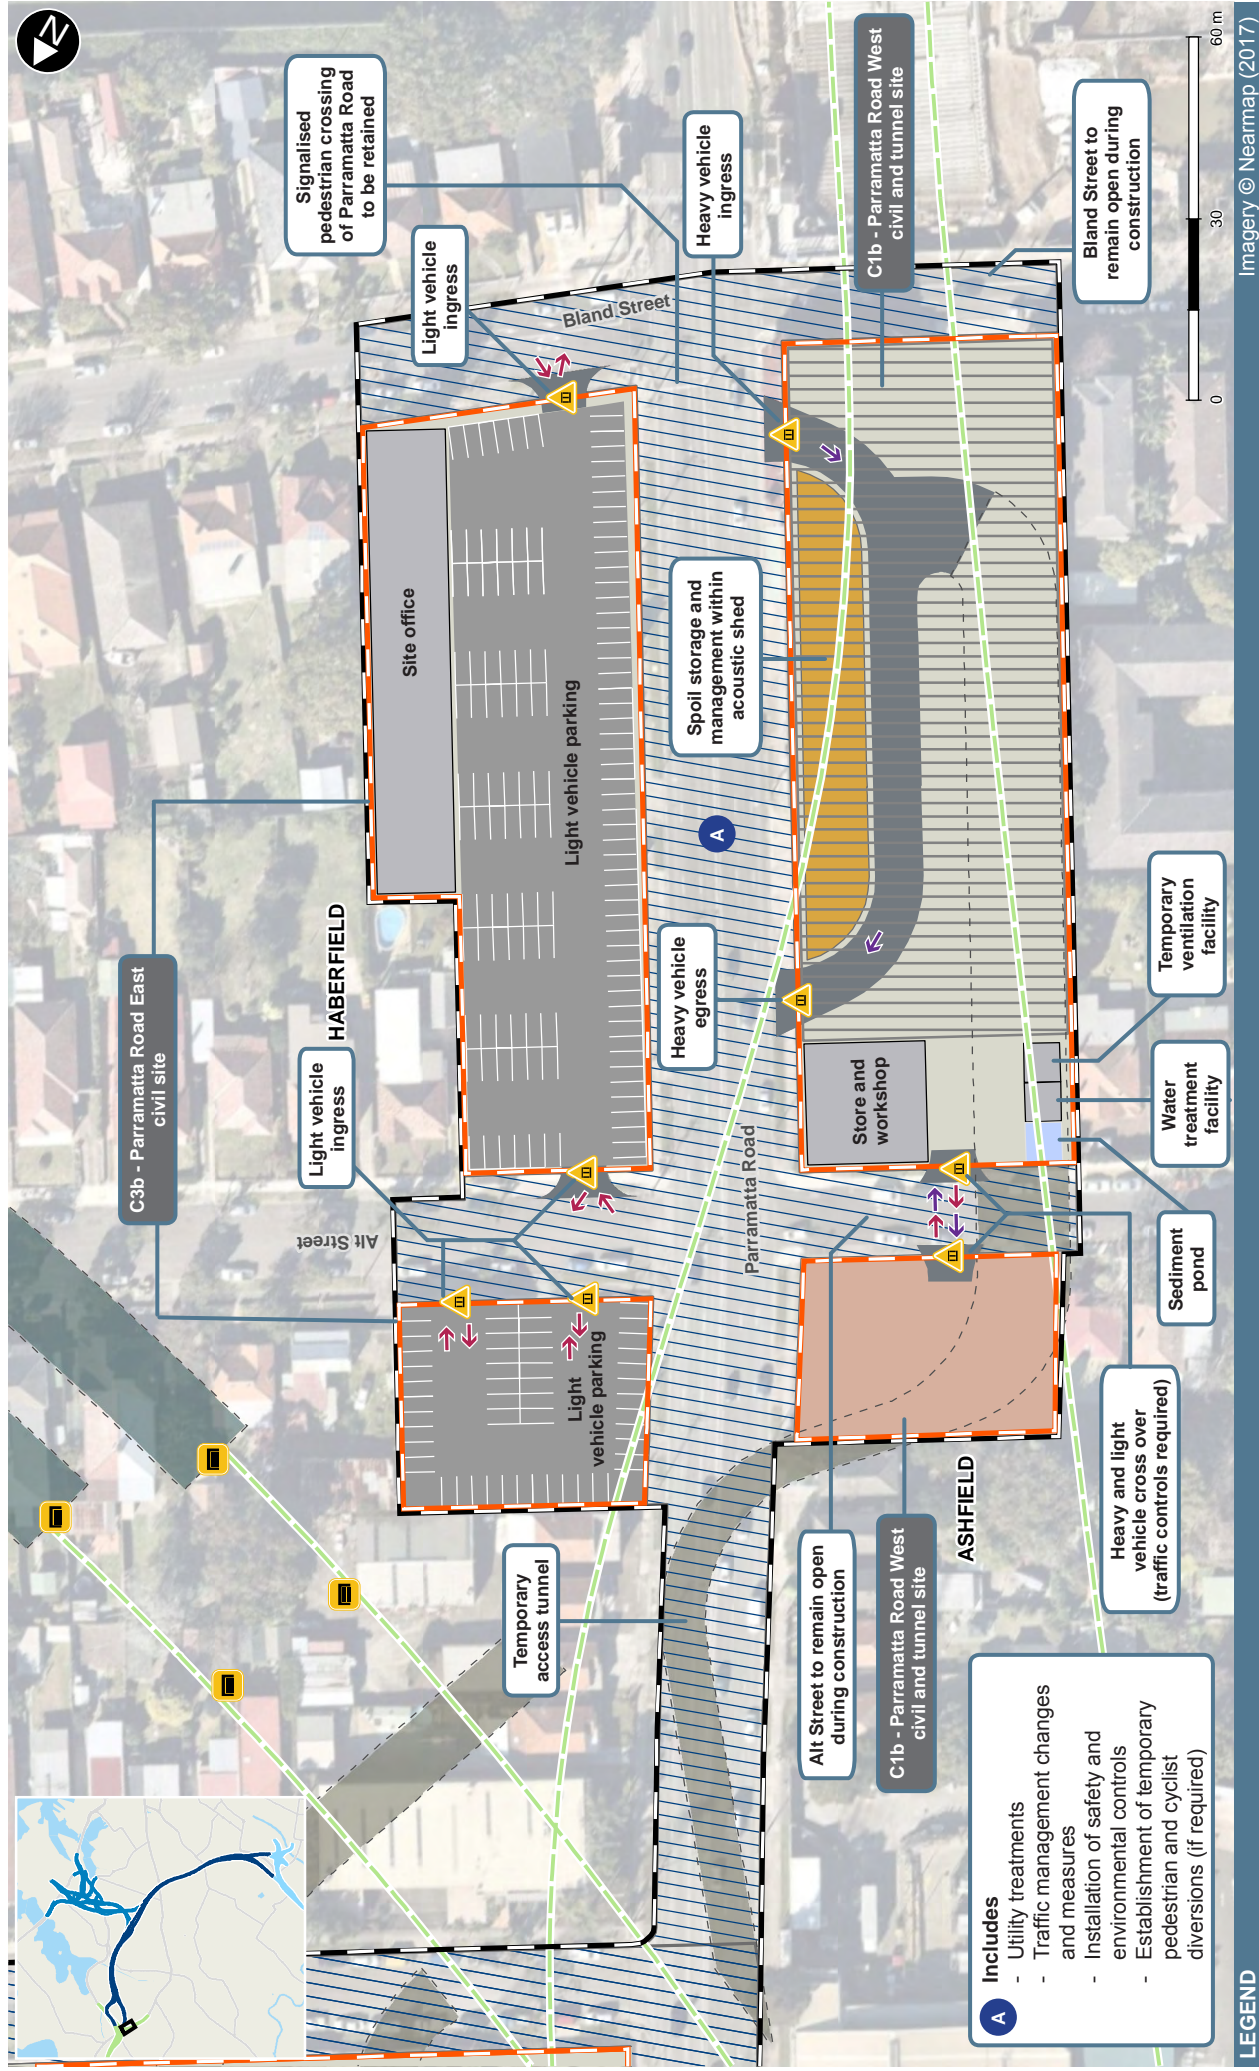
EIS Indicative Parramatta Road West civil and tunnel site (C1b) and Parramatta Road East civil site (C3b) layout
